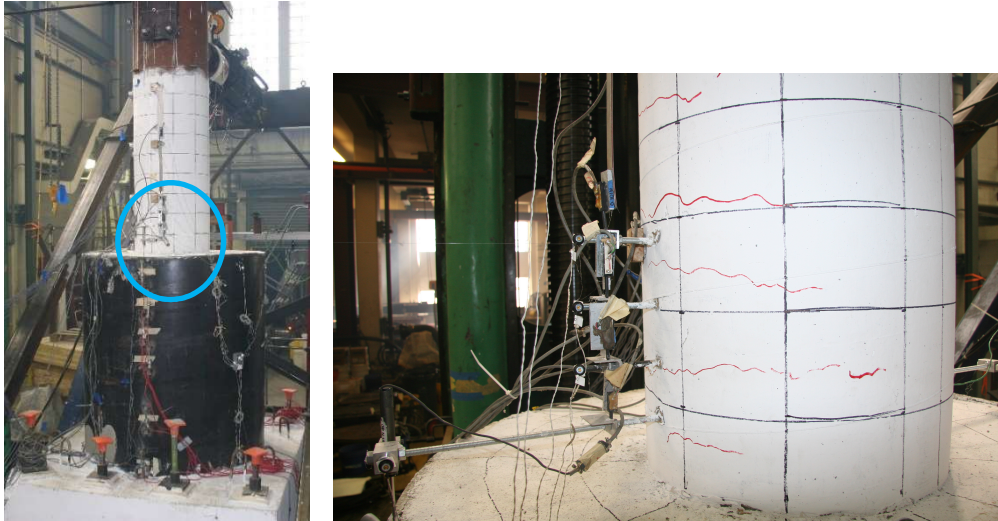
Specimen 48-21 Horizontal Cracks on North Column Face at 0.2% Drift
